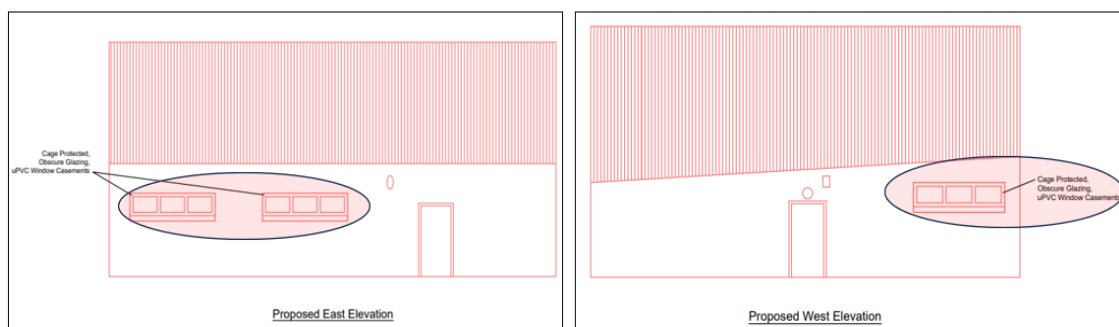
Eastern and Western Elevations as built (Drawing Nos. 03/202207/TN - East Elevation - Sports Hall and 03/202207/TN - West Elevation - Sports Hall).
